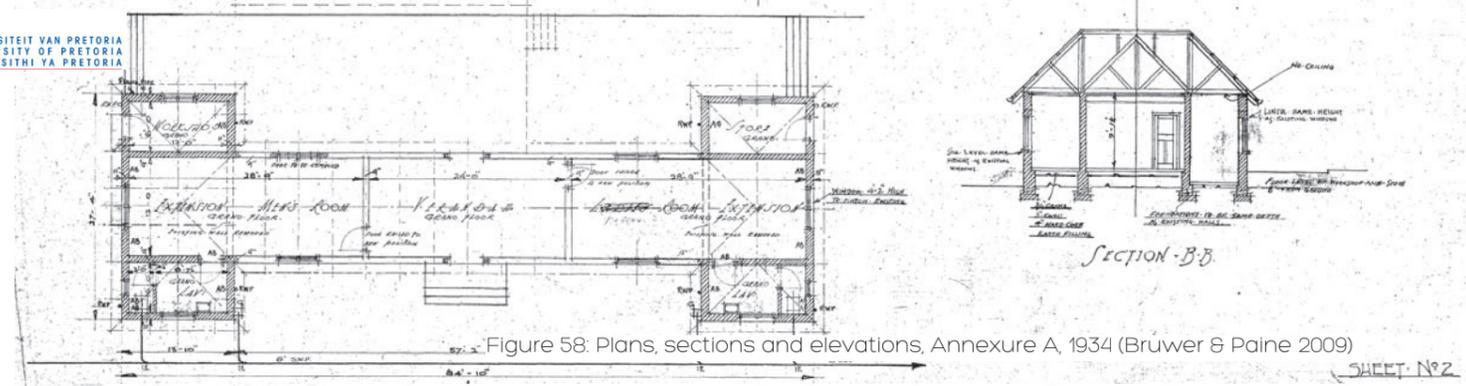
Plans, sections and elevations, Annexure A, 1934 (Bruwer & Paine 2009)
